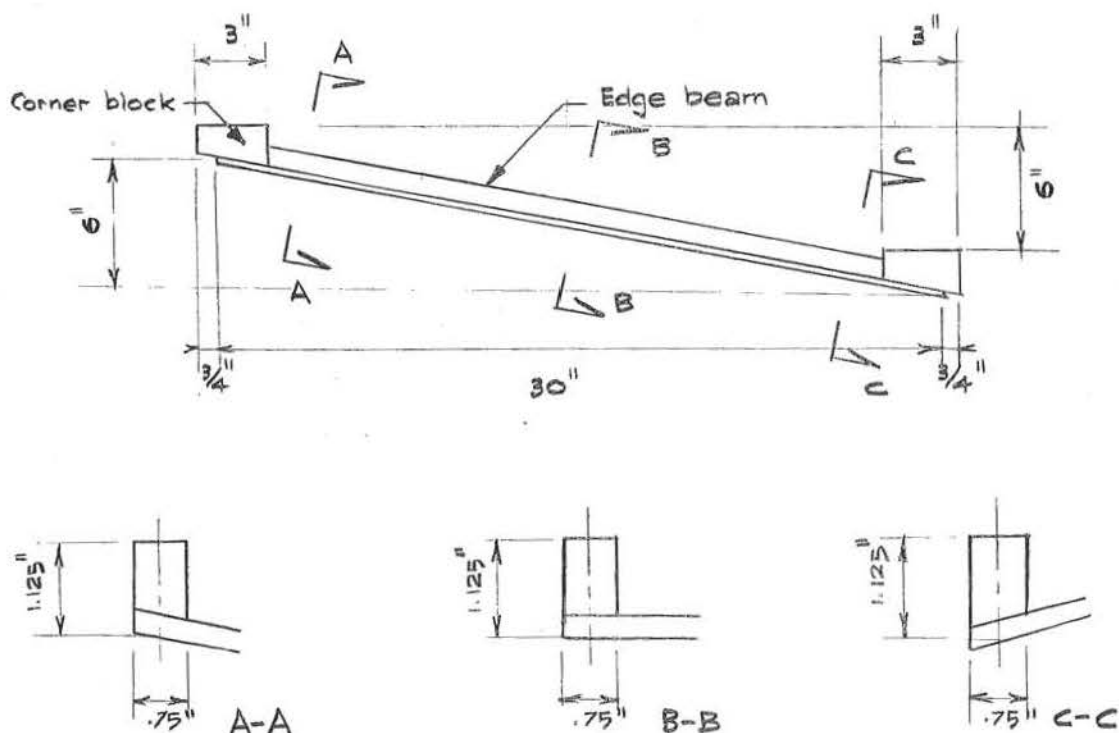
Details of Corner Blocks and Edge Beam Orientation.
